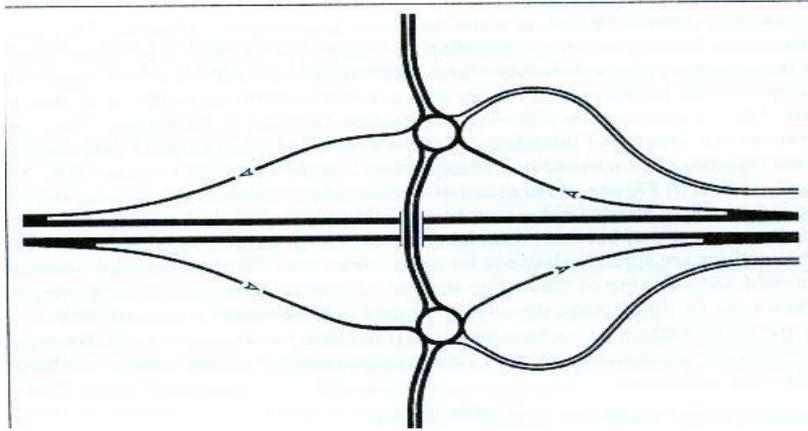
Roundabouts at Typical Diamond Interchange with Frontage Roads
